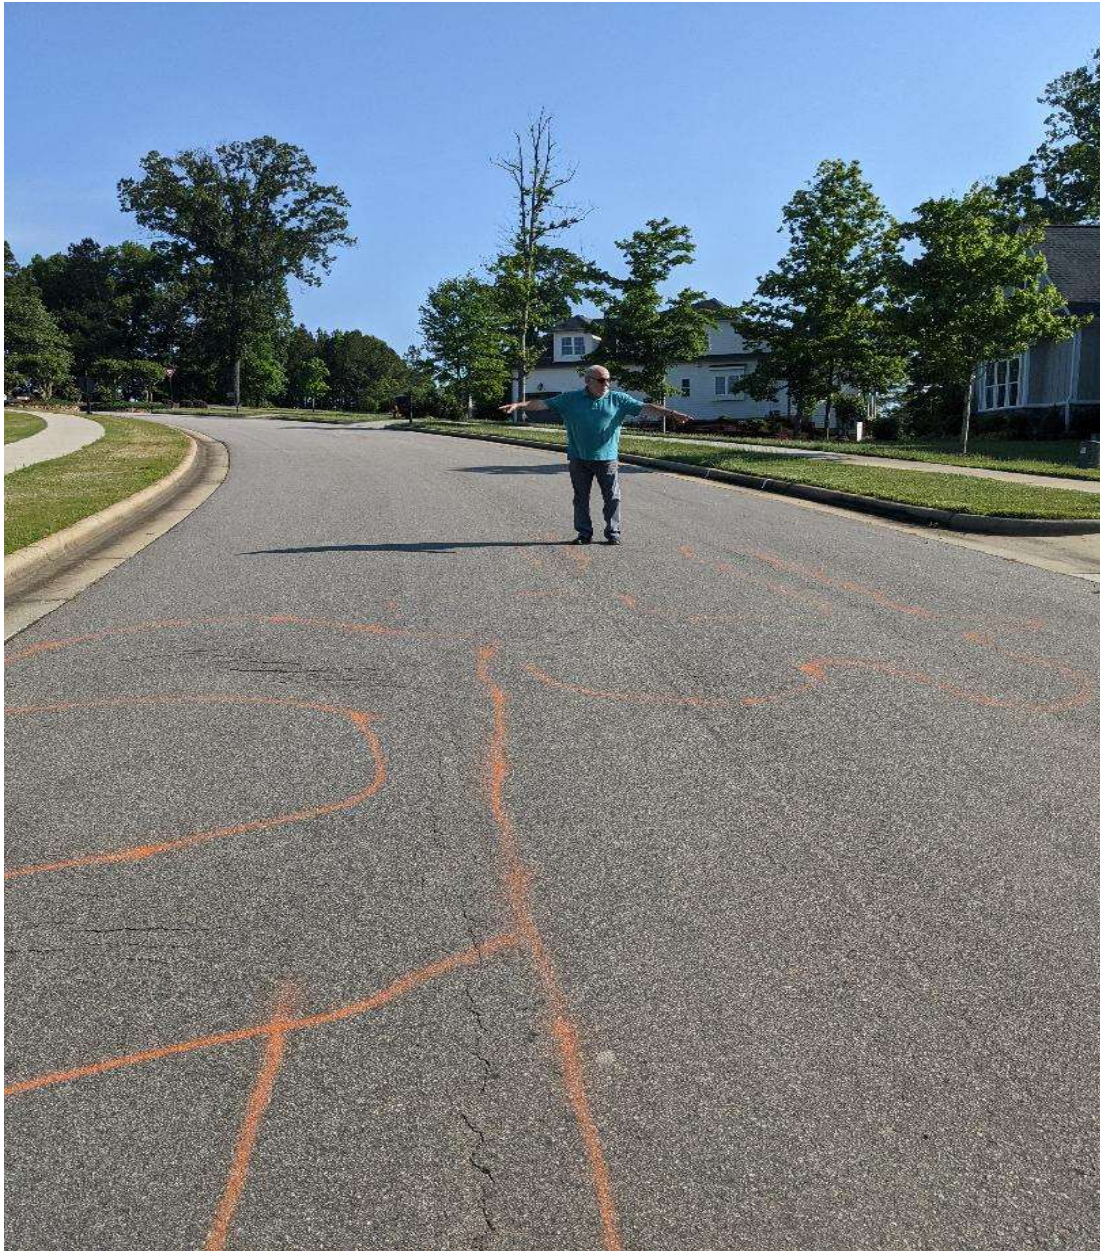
(continuation of illustration 7). The county requires developers to build roads to standards and stay suitable and strong for residential use. Yet the developer heavy equipment traffic damages roads and then the Freehold expects residents to pay for repairs charged to the HOA's reserve fund or added to the declarant loan.
